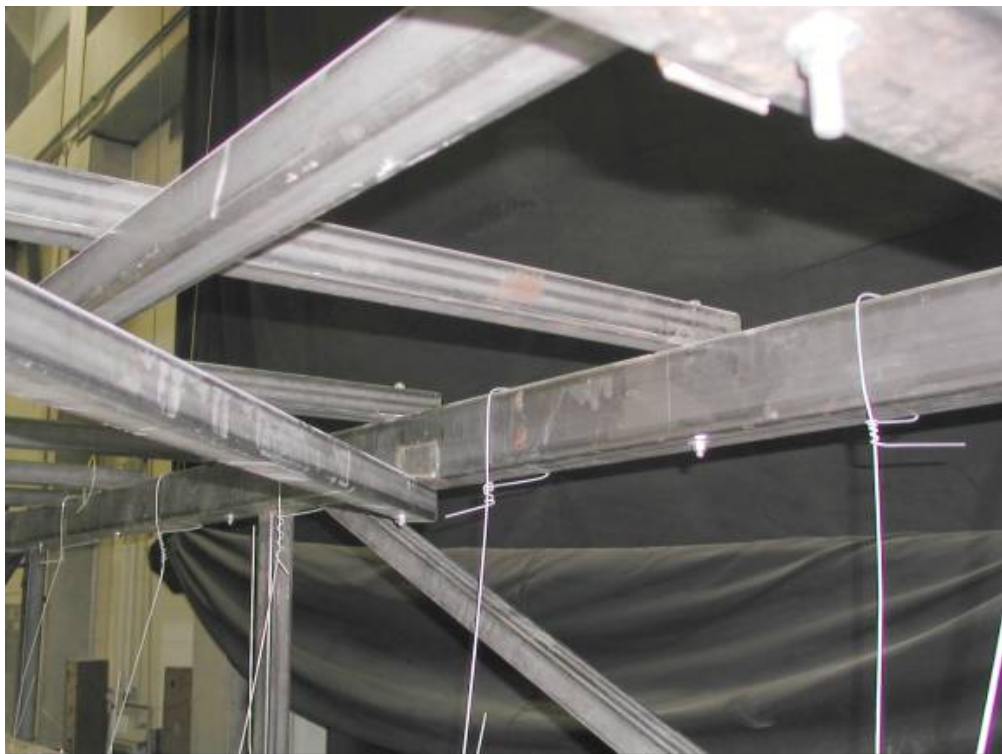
Detail D, roof framing connection in the East-West direction
